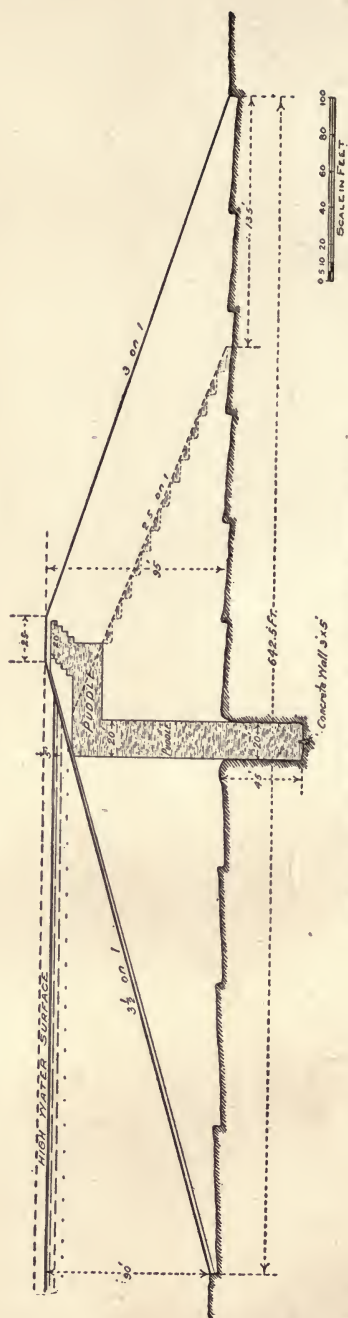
CROSS-SECTION OF SAN ANDRES DAM.
